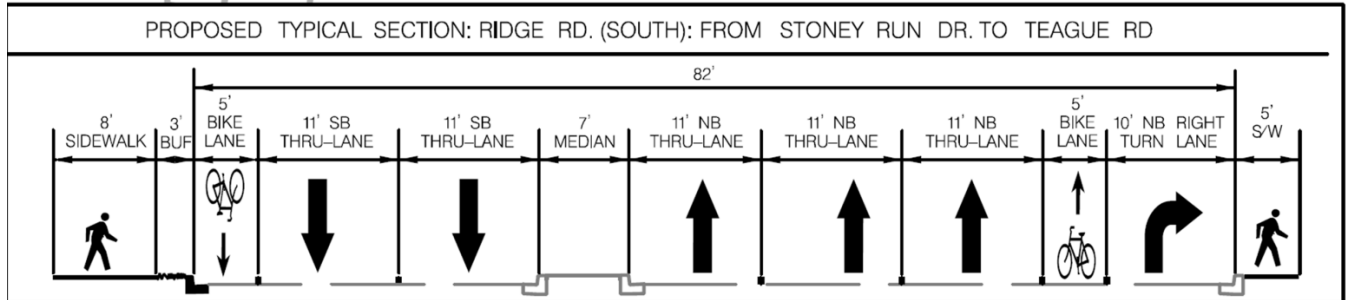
Proposed Cross-section for Ridge Road from Stoney Run Dr to Teague Rd.
